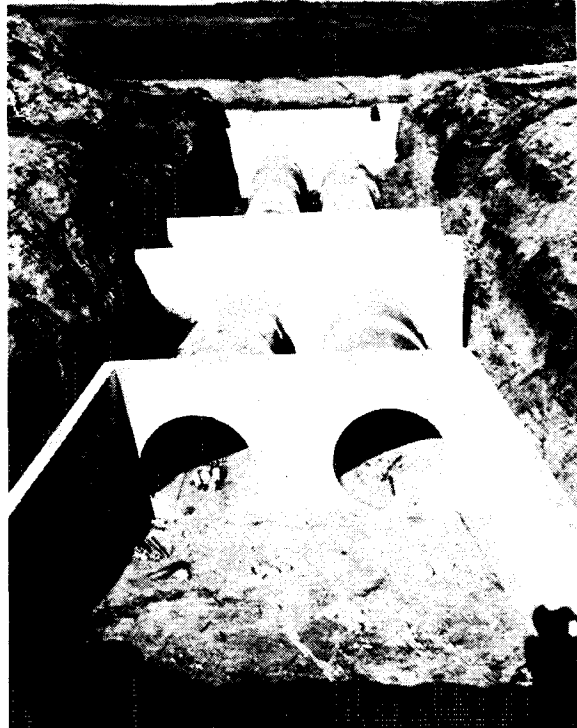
Double-barreled pipe culvert with concrete percolation collars. P-328-701-2021
